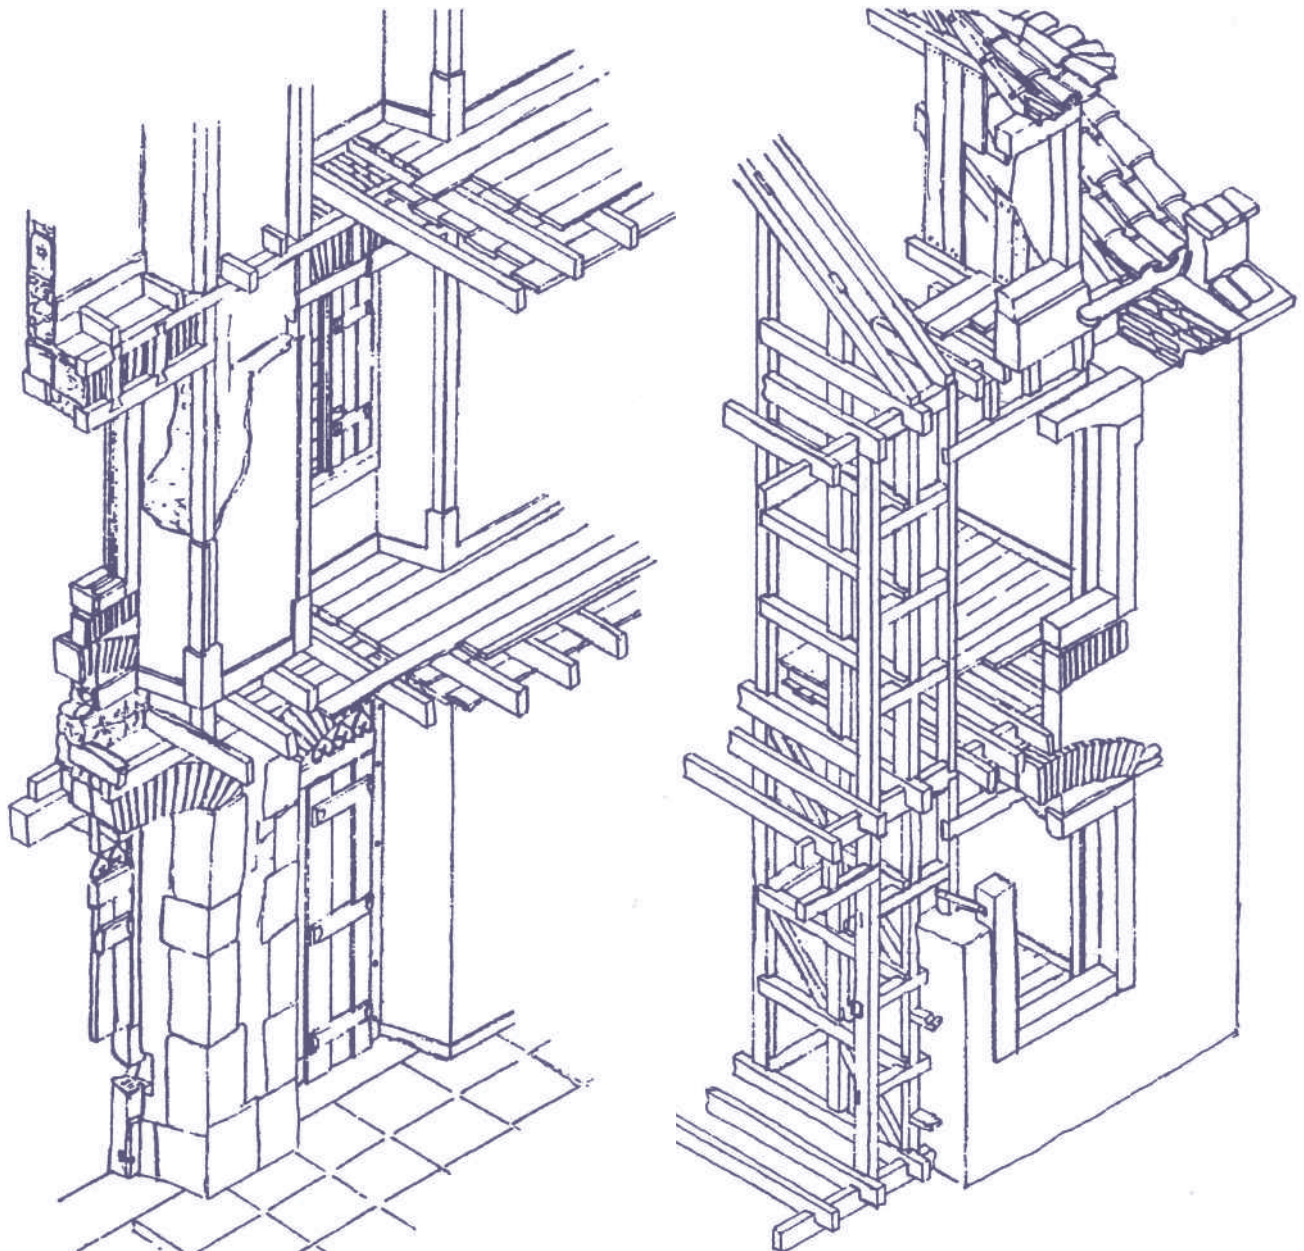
Articulation of the *Gaiola Pombalina*'s wood structure with the exterior wall's stone masonry.
